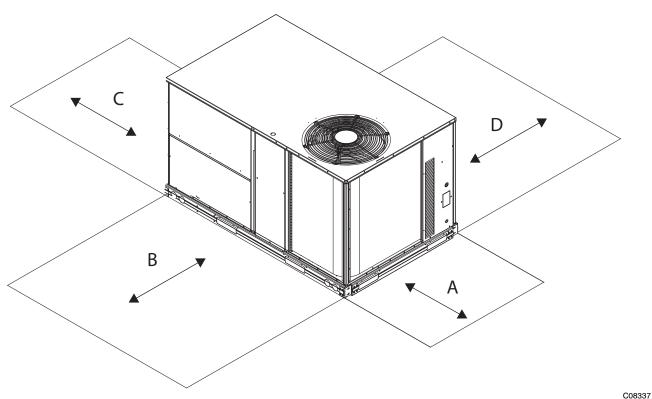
Dimension 582J 04-06 (sheet 2 of 2)
